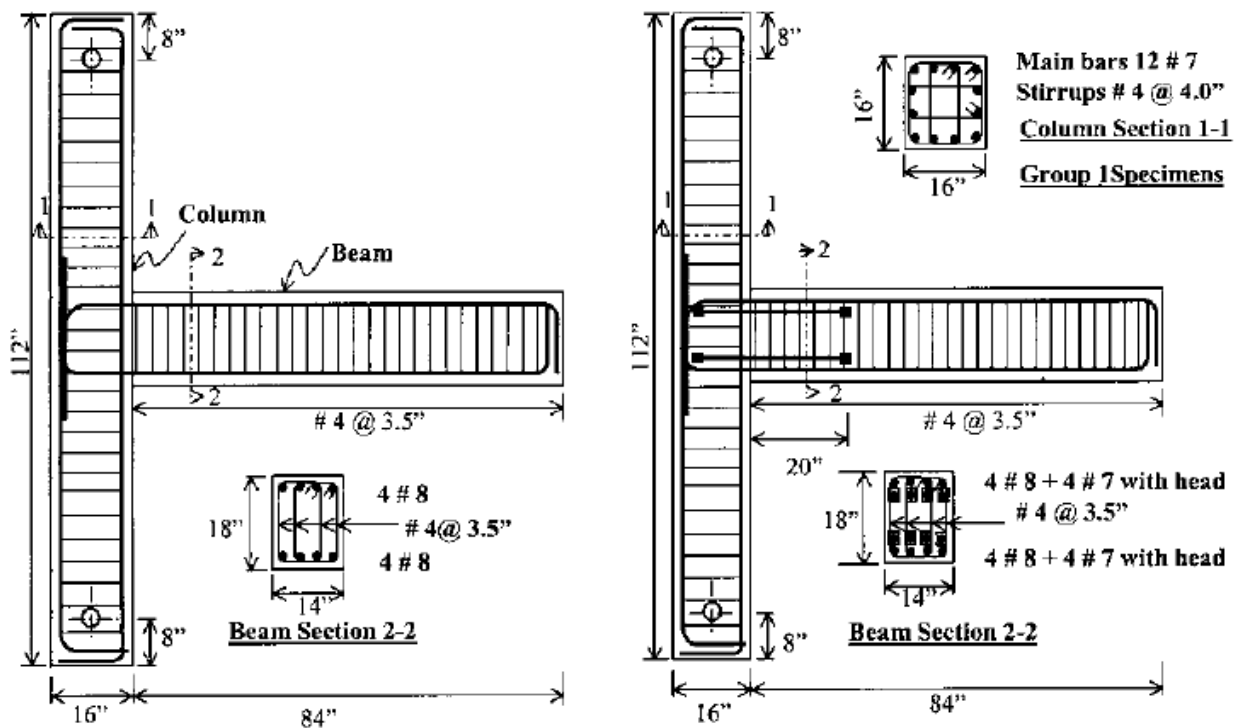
Schematic drawings of exterior beam-column joints with and without straight-headed bars (Chutarat and Aboutaha 2003)
